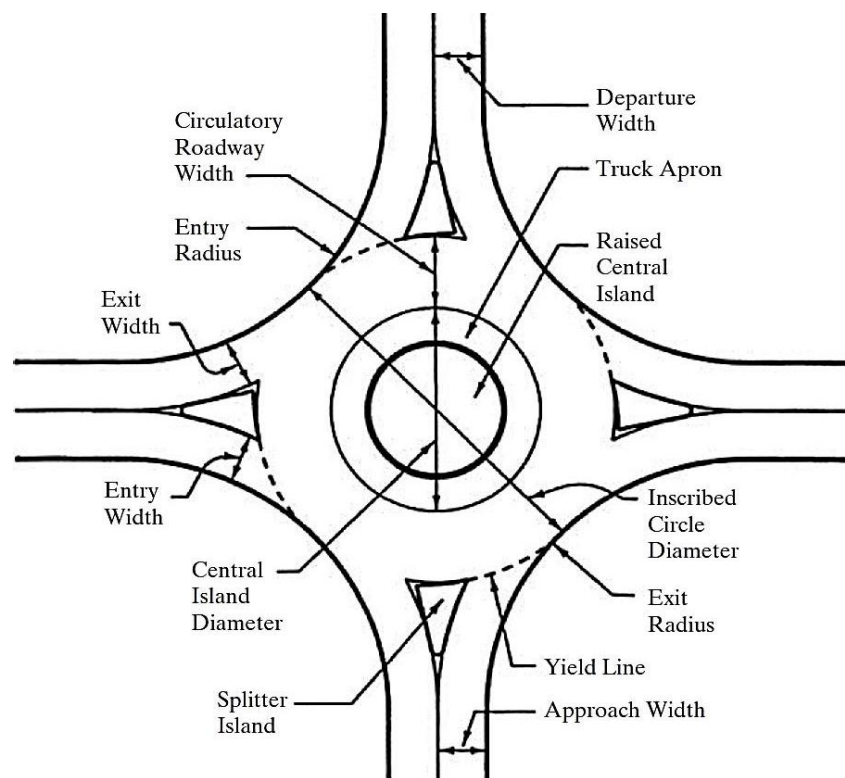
/5: Geometric Elements of a Single-Lane Roundabout [2, p. 275]
